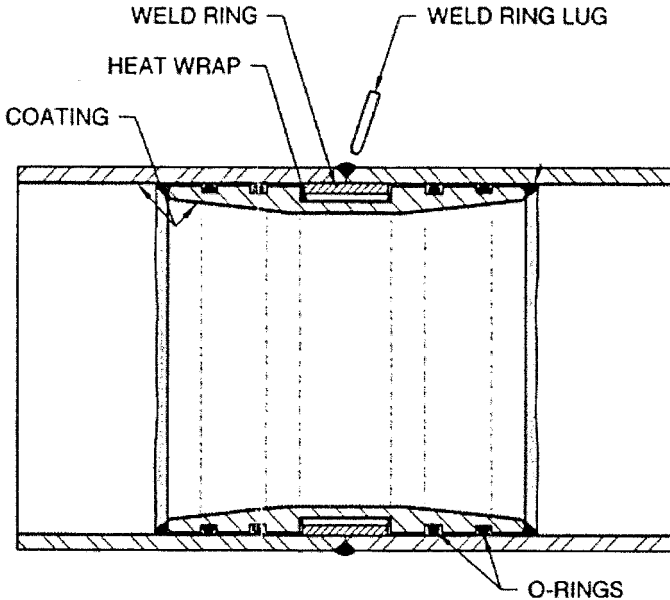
Welded internal coupling system. The coupling is internally coated with FBE and externally coated to include the o-rings.
